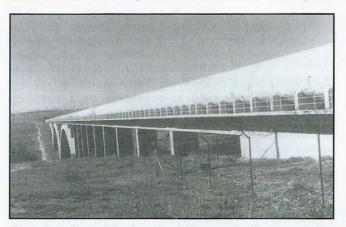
Part of one of the three pipe bridges carrying the sewer pipeline. (Insulation has been removed from 36 pipe lengths from right to left)
